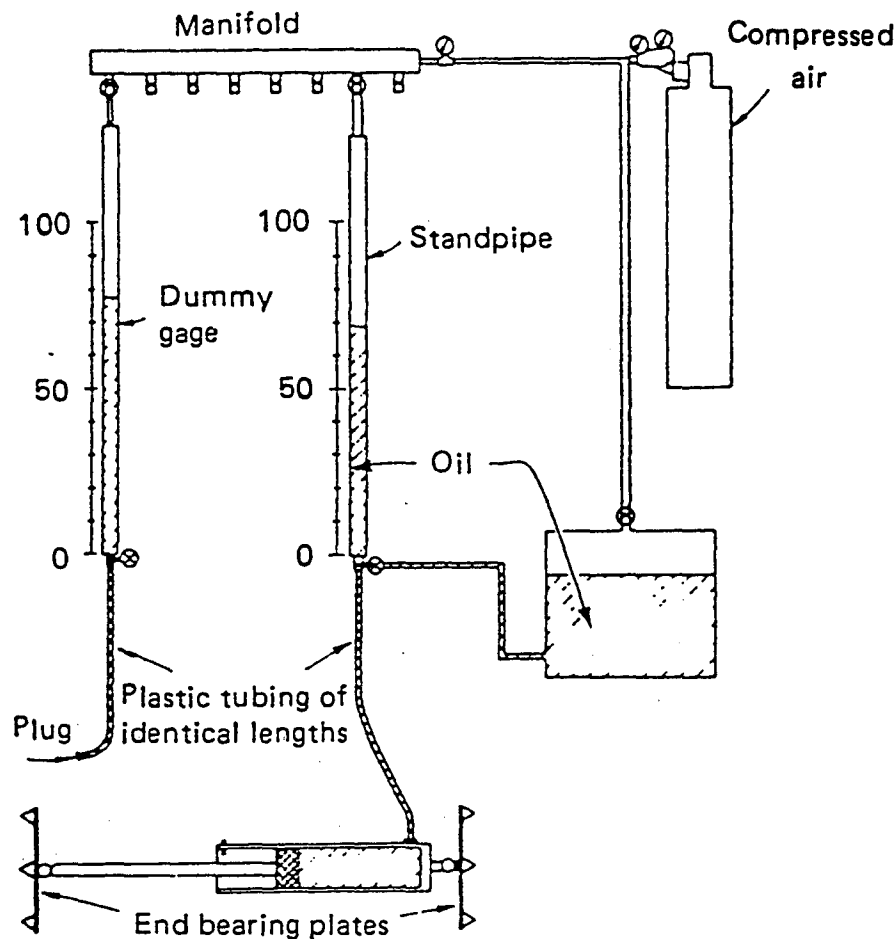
Schematic of Hydraulic Gage Used to Measure Convergence of Slurry Trench.
